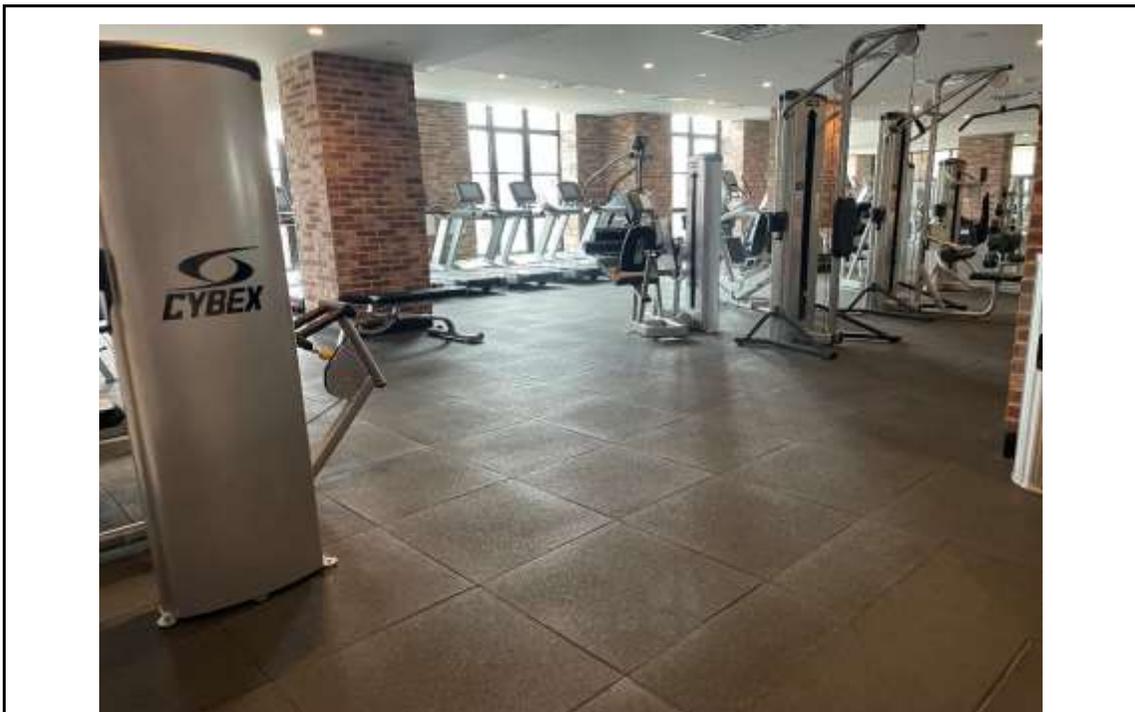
First floor concrete slab covered with soft tiles within the gym, facing southeast. 02 March 2023.
